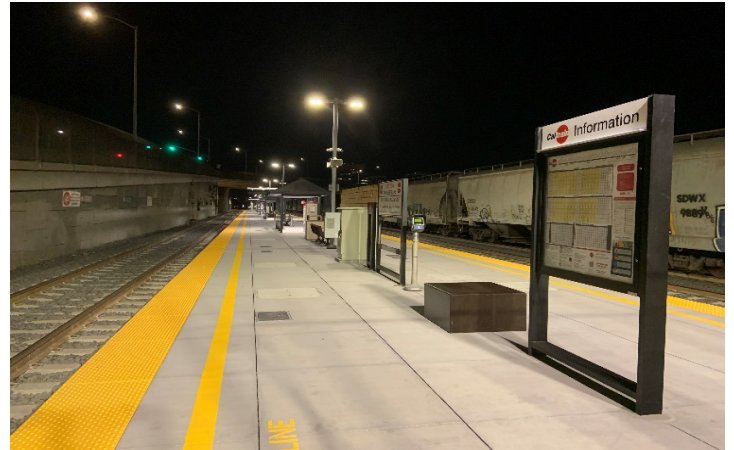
Station Platform South End incl Box Covering PCEP Foundation
